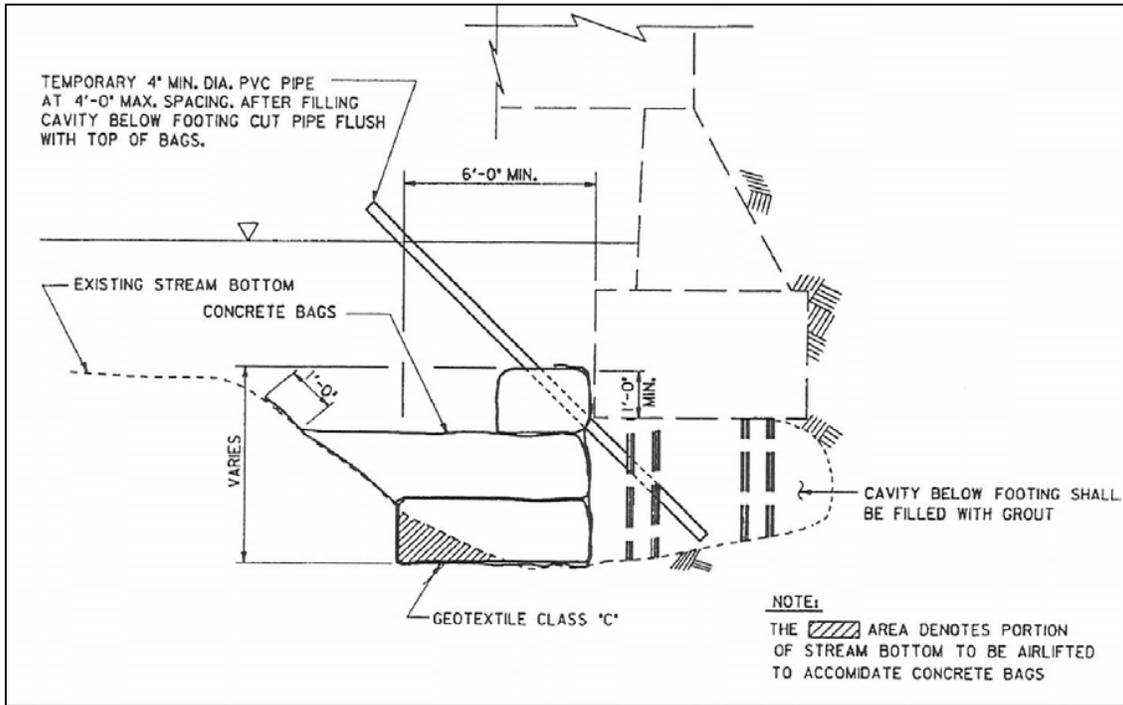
Grout bag repair at a bridge abutment (Source: Browne et al. (2010)).
